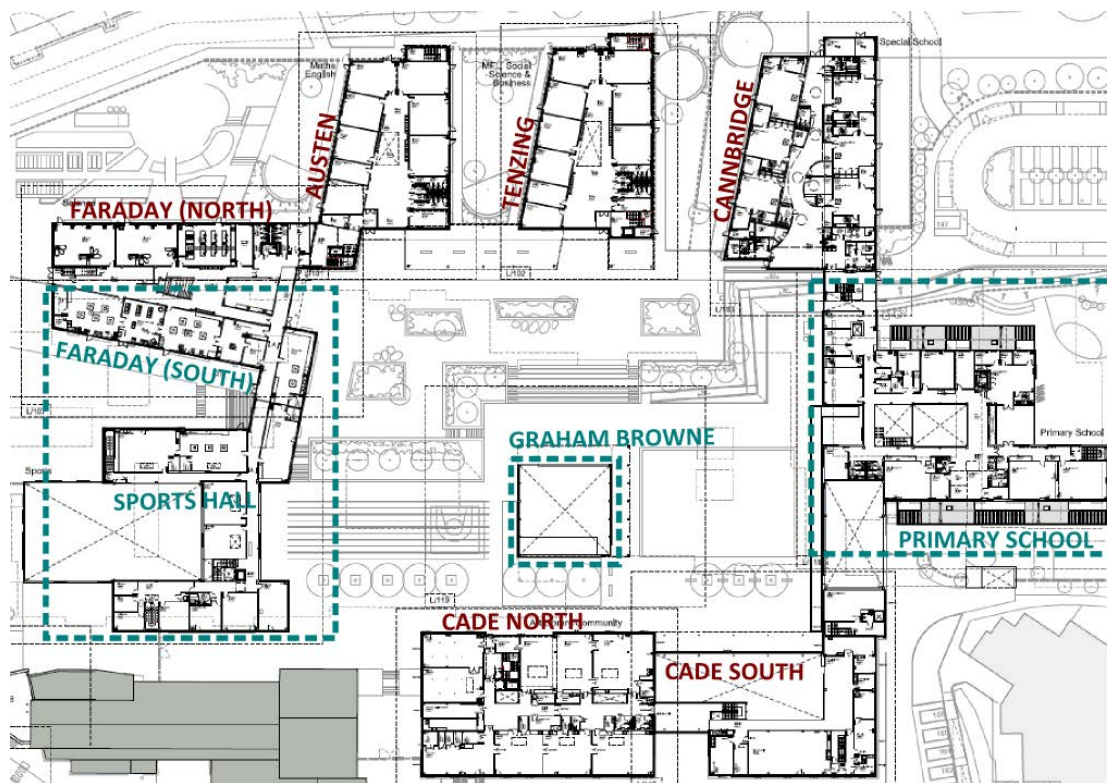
The school campus site plan, red labels indicate Phase 1 buildings included in the TSB BPE study and green labels indicate Phase 2 and 3 buildings that were not.
